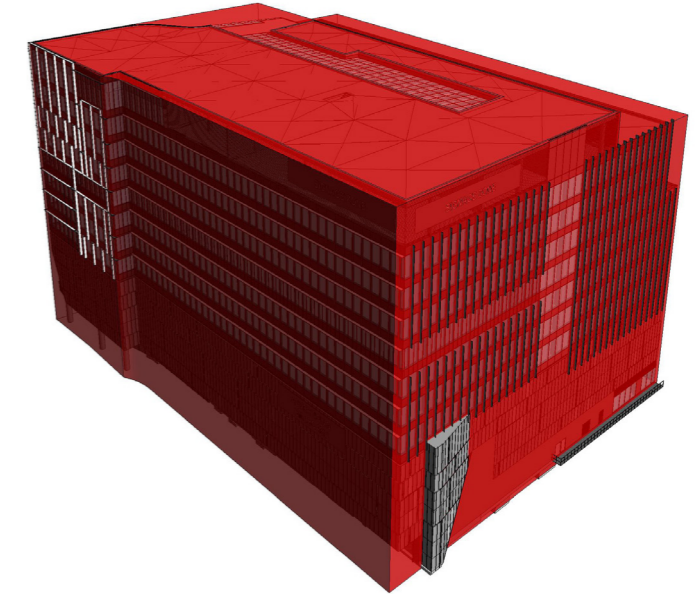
Parameter Plan envelope overlay. Aerial view at north west corner.
